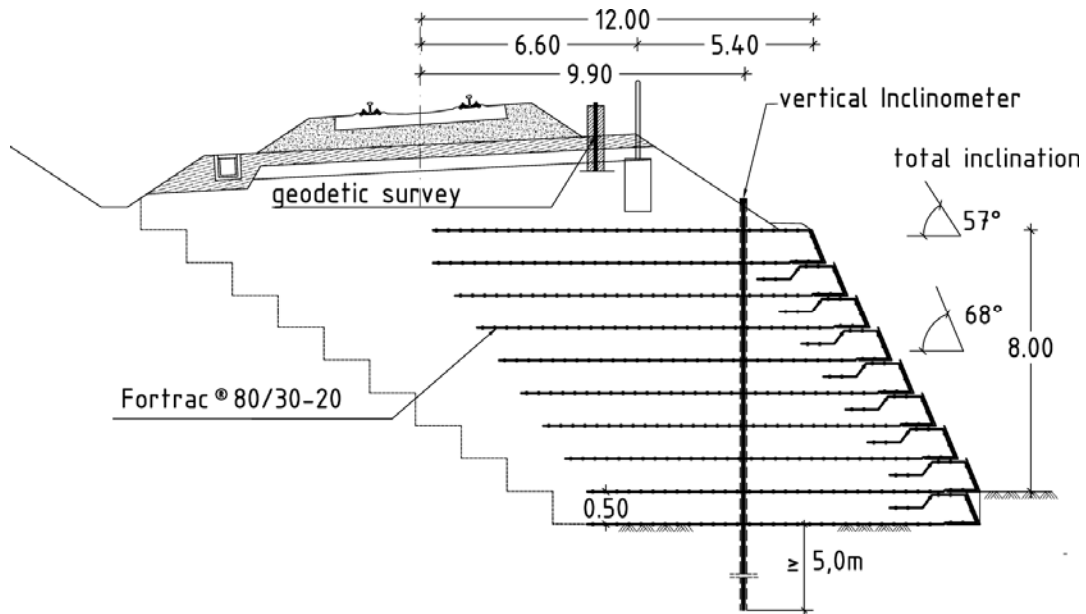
Hub Cologne-Mülheim, Typical cross-section measuring point MST1 and MST2
